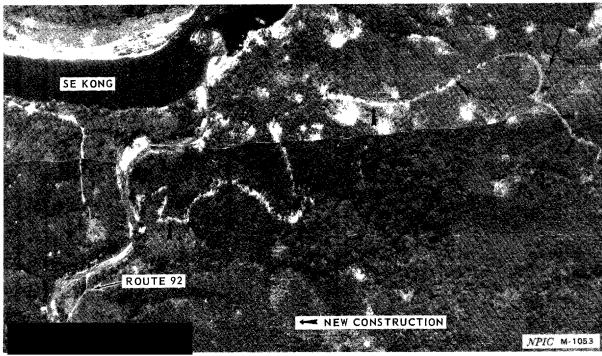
ROAD CONSTRUCTION, BAN BAC, LAOS
